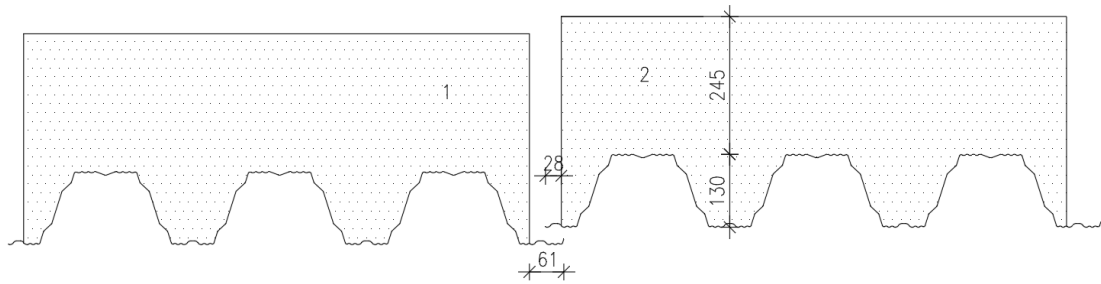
Dimensions in longitudinal overlapping with straight joint in prefabricated elements.
